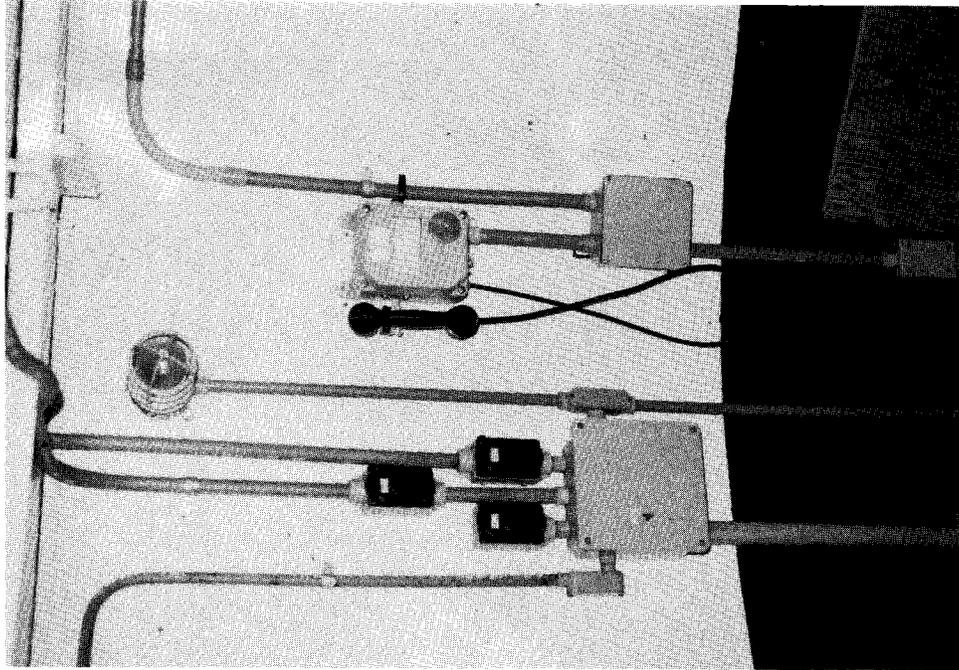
Room 112, telephone intercom system and electrical equipment on northeast wall of Watch Deck.
